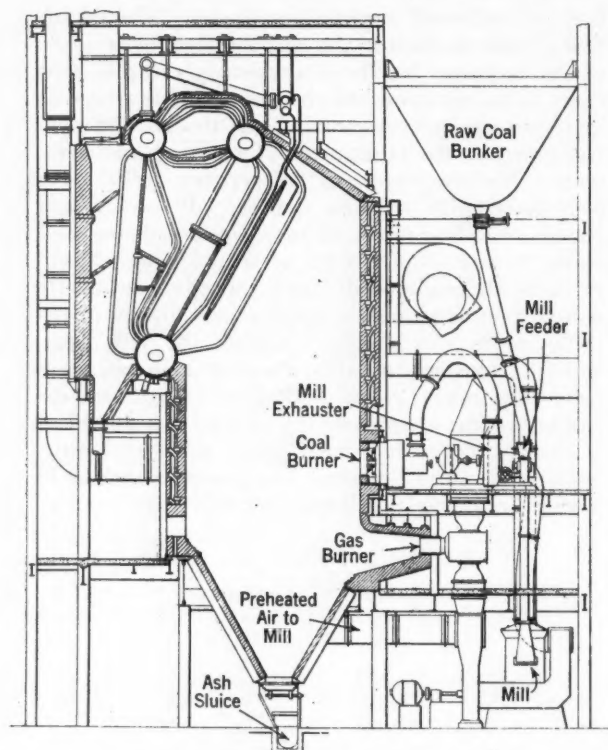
Section through plant showing the general arrangement of the equipment forming one of the steam generating units burning blast furnace gas and coal.
